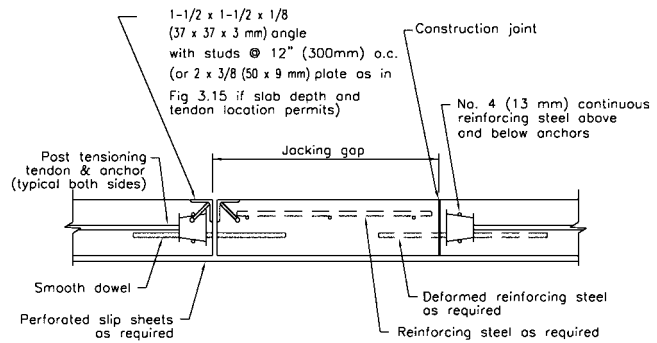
Typical doweled joint detail for post-tensioned slab.
